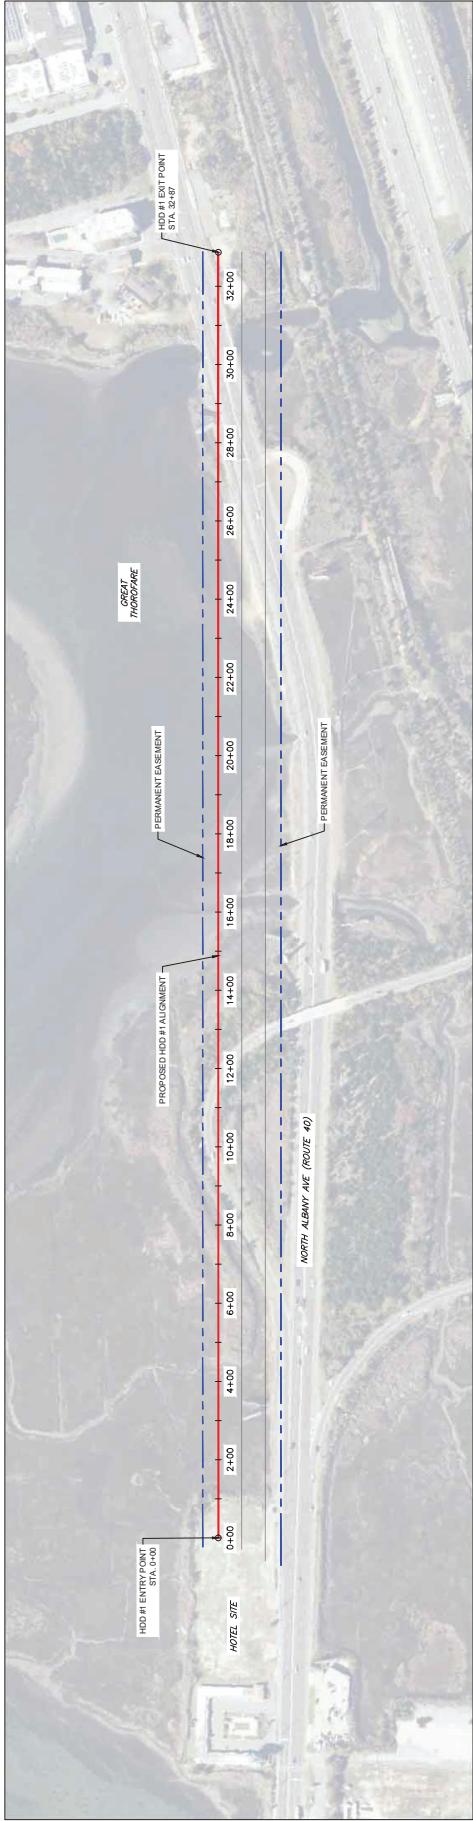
Great Thorofare Crossing #3 HDD Plan & Profile
